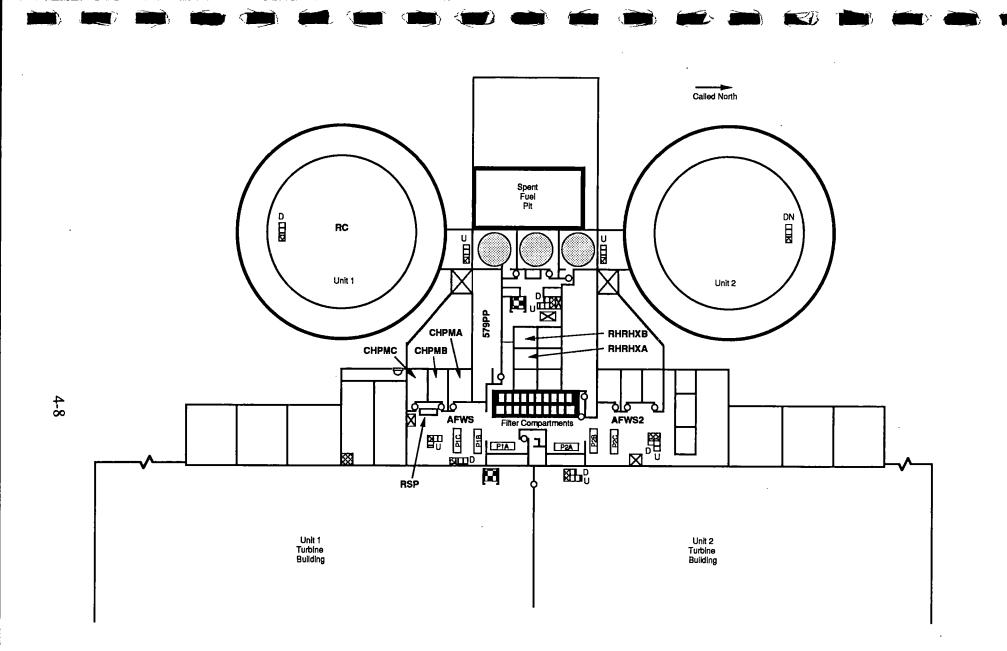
Zion 1 and 2 General Arrangement, Elevation 579'
